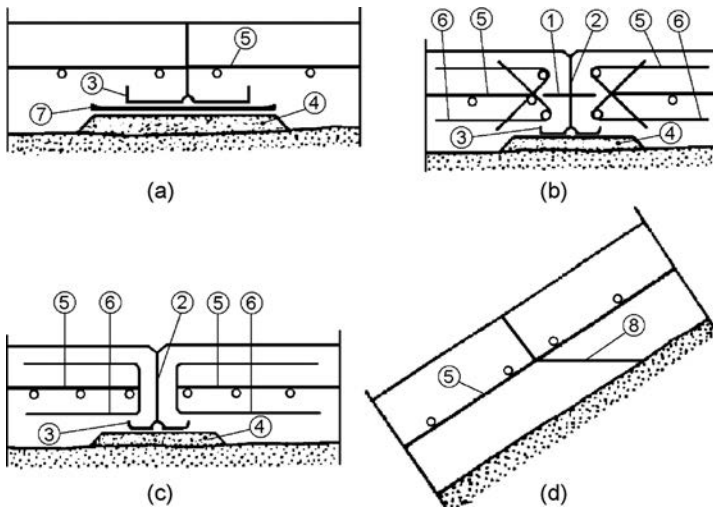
Slabs of the facing with reinforcement and control structural joints. (a) Vertical joint with reinforcement through it; (b) vertical joint without reinforcement through it, with a double waterstop; (c) same as in case (b), but with only one waterstop; (d) horizontal joint. (1) central waterstop; (2) bituminous coating; (3) waterstop at bottom; (4) mortar bedding; (5) main reinforcement through the slab; (6) additional reinforcement; (7) bituminous felt; (8) broken joint.
